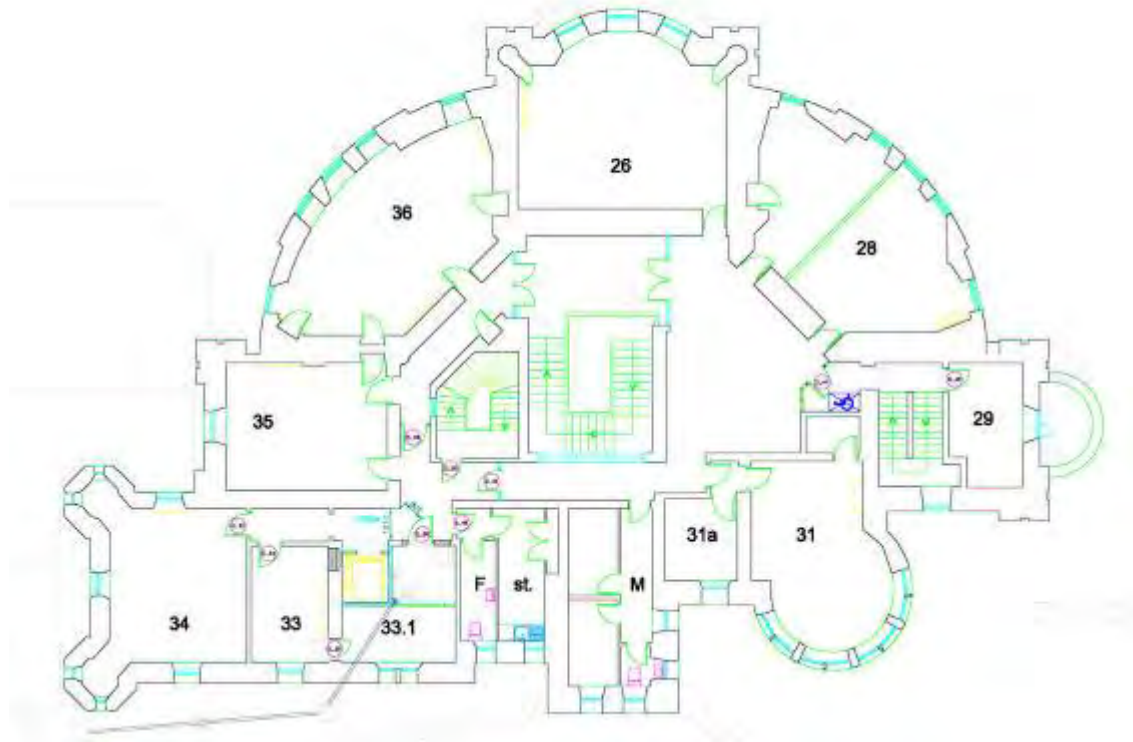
First floor plan of Airthrey Castle 2009 UoS
